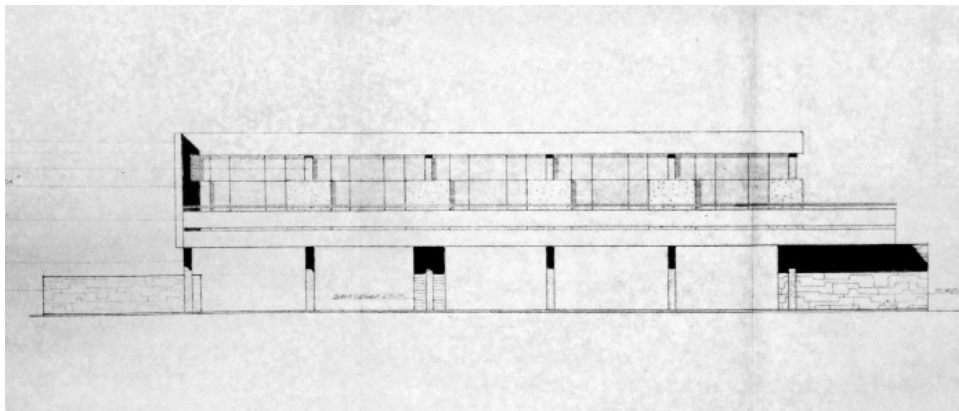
Kindergarten at A. Zawadzkiego Street in Katowice. Design of façade, O. Zietkiewicz, 1970. SAK, fond 437, ref. no. 1/4.
